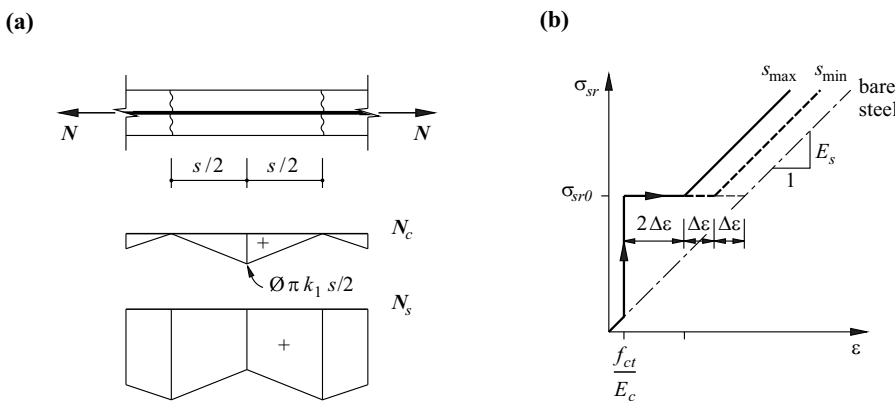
Reinforced concrete tie: (a) diagrams of normal forces in concrete and steel in crack element, (b) steel stress at crack depending on mean normal strain
